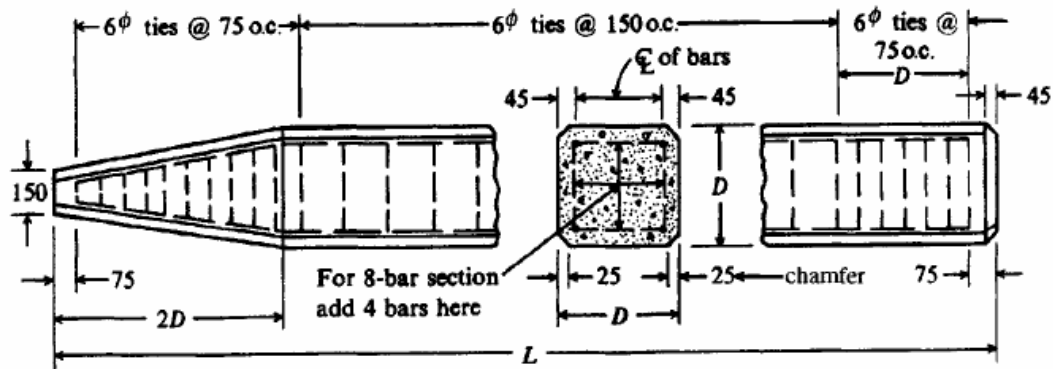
Precast concrete piles (Foundation analysis and design, 1997)
